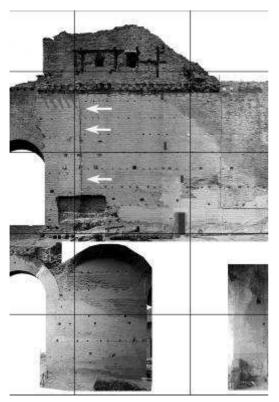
East perimeter wall, exterior. Construction joint between the section of the wall supporting the barrel vault, which was subject to enormous loads in part due to the thrust of the adjacent cross vault over the central nave, and the windowed infill section of the wall, which was subject to only minor loads. During a second phase, a large ribbed buttressing arch has been constructed against it to ensure the stability of the wall, leaving clear traces in the original wall.
